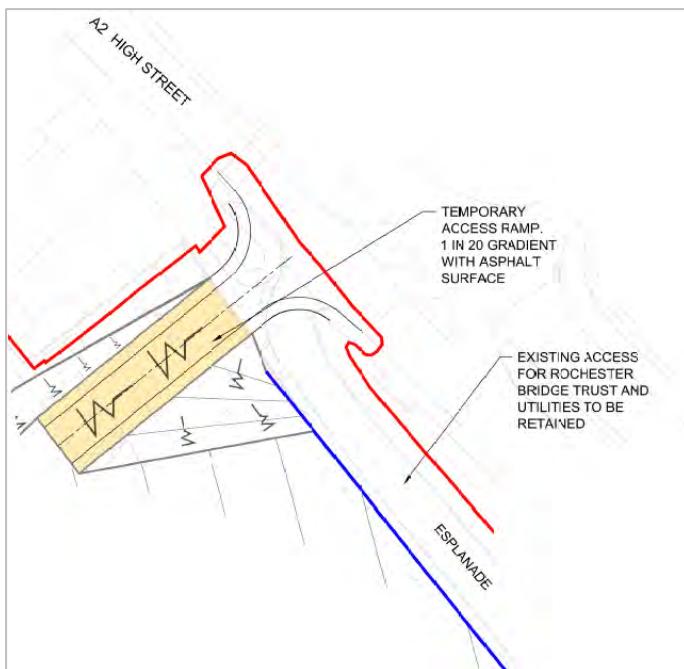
Clip of general arrangement between Rochester Bridge and High Street (A2) on the Phase 1 site
